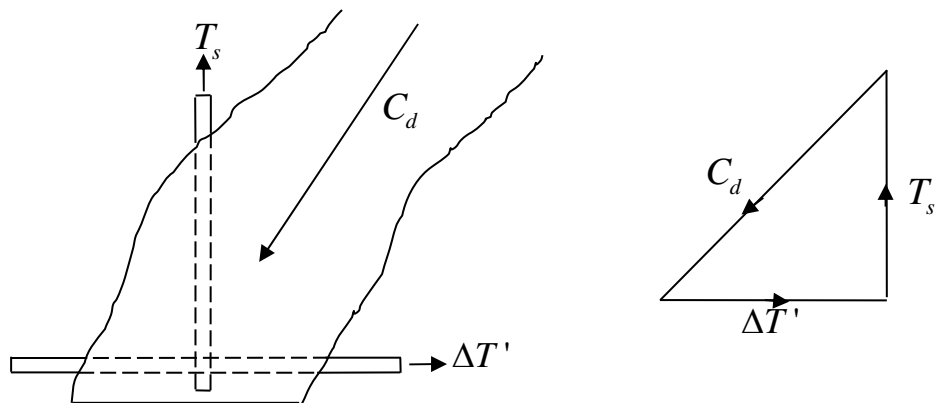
Concrete cantilevers acting as struts [Park and Paulay, 1975]
